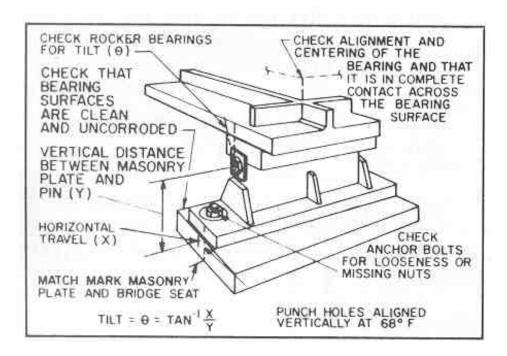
Rocker Bearing Inspection Checklist Items
